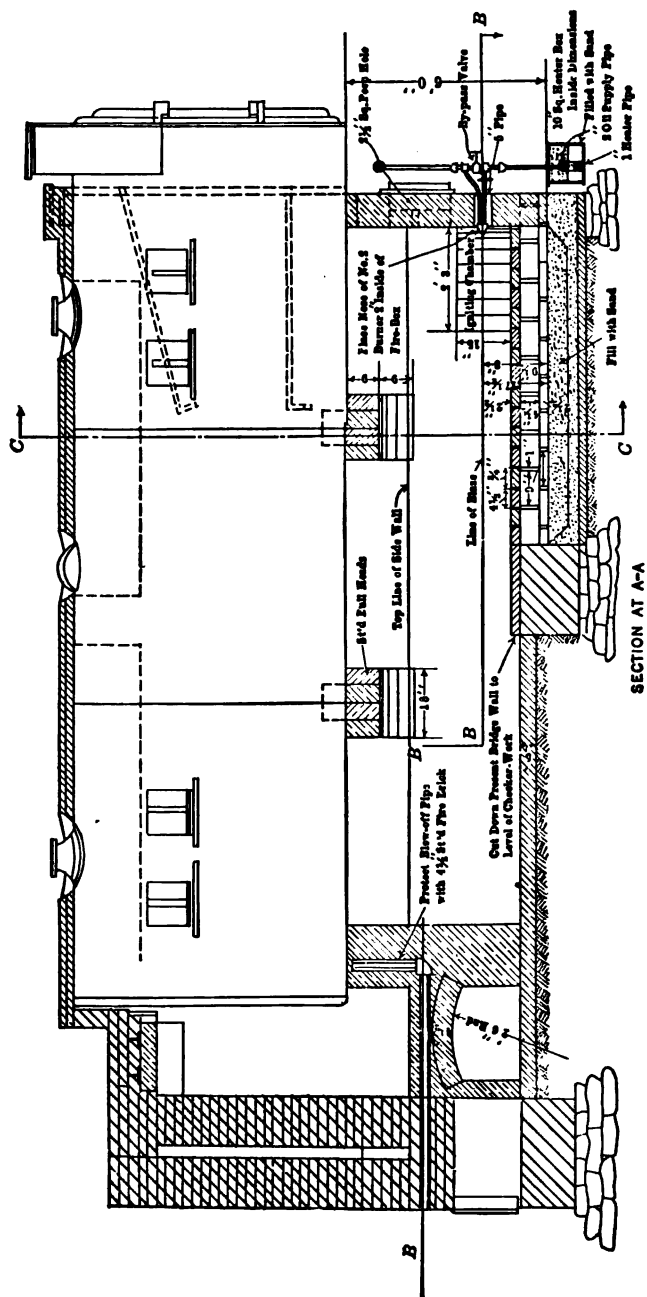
Old-fashioned or low setting for horizontal return tubular boiler.
